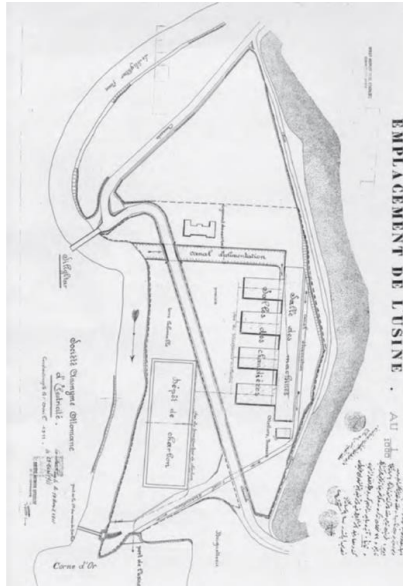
Silahtarağa Power Plant, site plan drawn in 1910.
